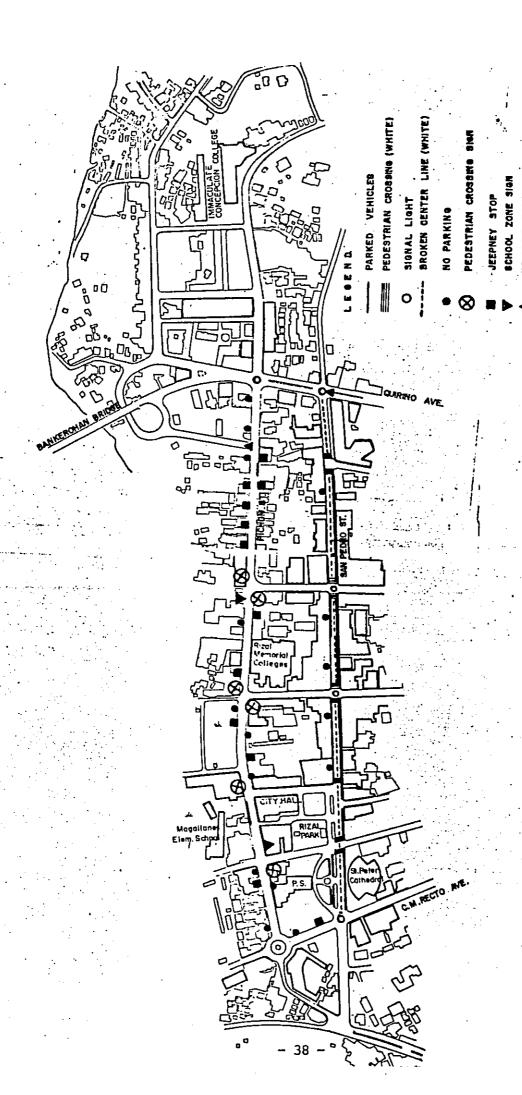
EXISTING ROAD SIGNS AND MARKINGS
